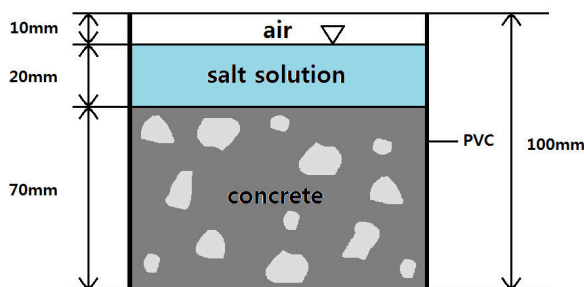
Schematic Drawing of Concrete Specimen for Scaling Test
